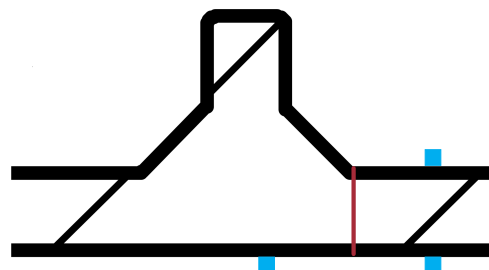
Detail of Attachment on Tubular Specimen Including expected uni-axial tension fracture plane (red) and proposed receiver positions (blue)
